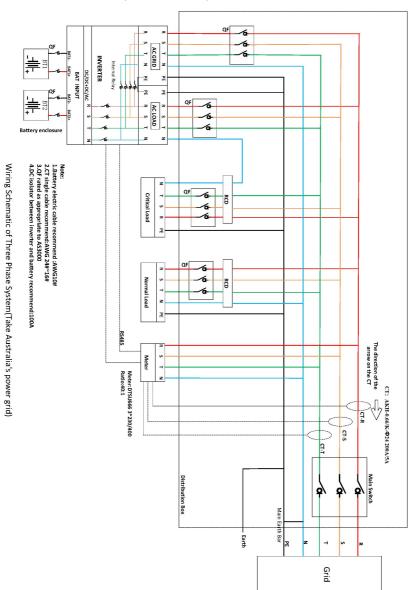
Electrical connections (Plan B:Meter +CT)
